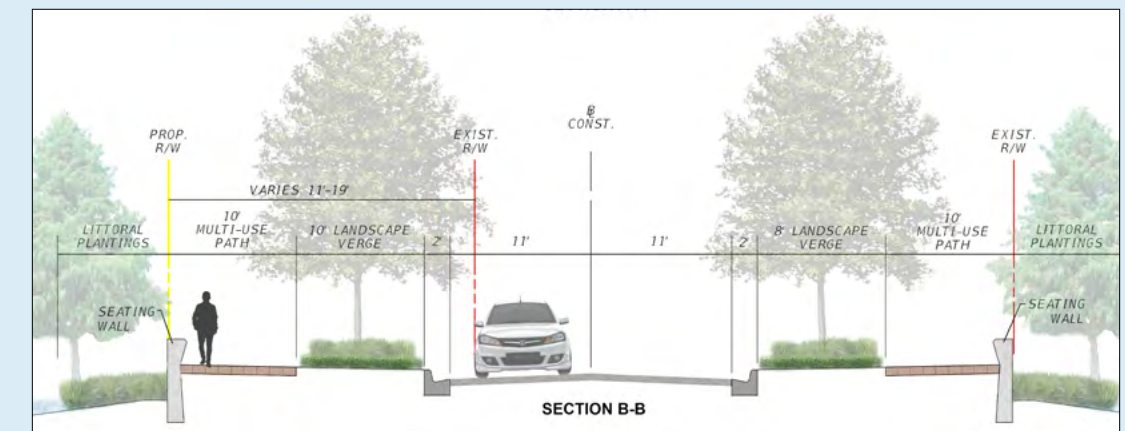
The image above is a cross section of the proposed design of SE MLK Boulevard from SE Bayou Avenue to SE Bahama Avenue.
